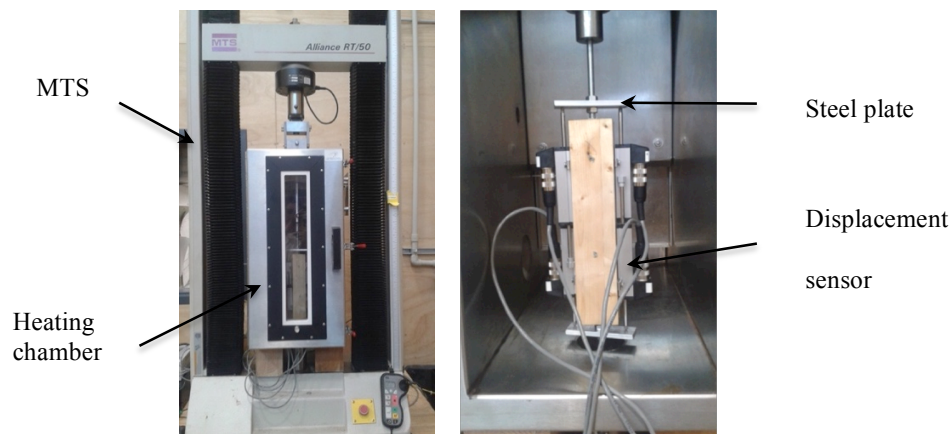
a) Setup on MTS press, b) instrumented glued in rod specimen
